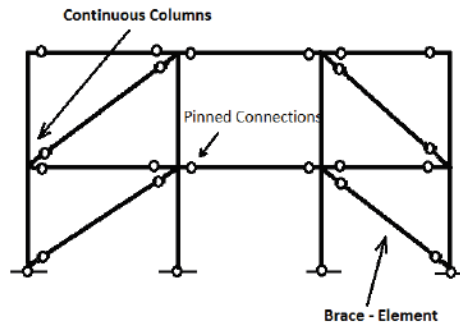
Geometrical configuration of a typical plane steel BRB frame
